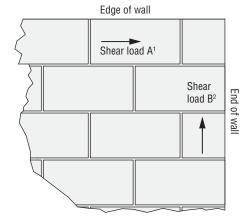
Direction of Shear Load in Relation to Edge and End of Wall
